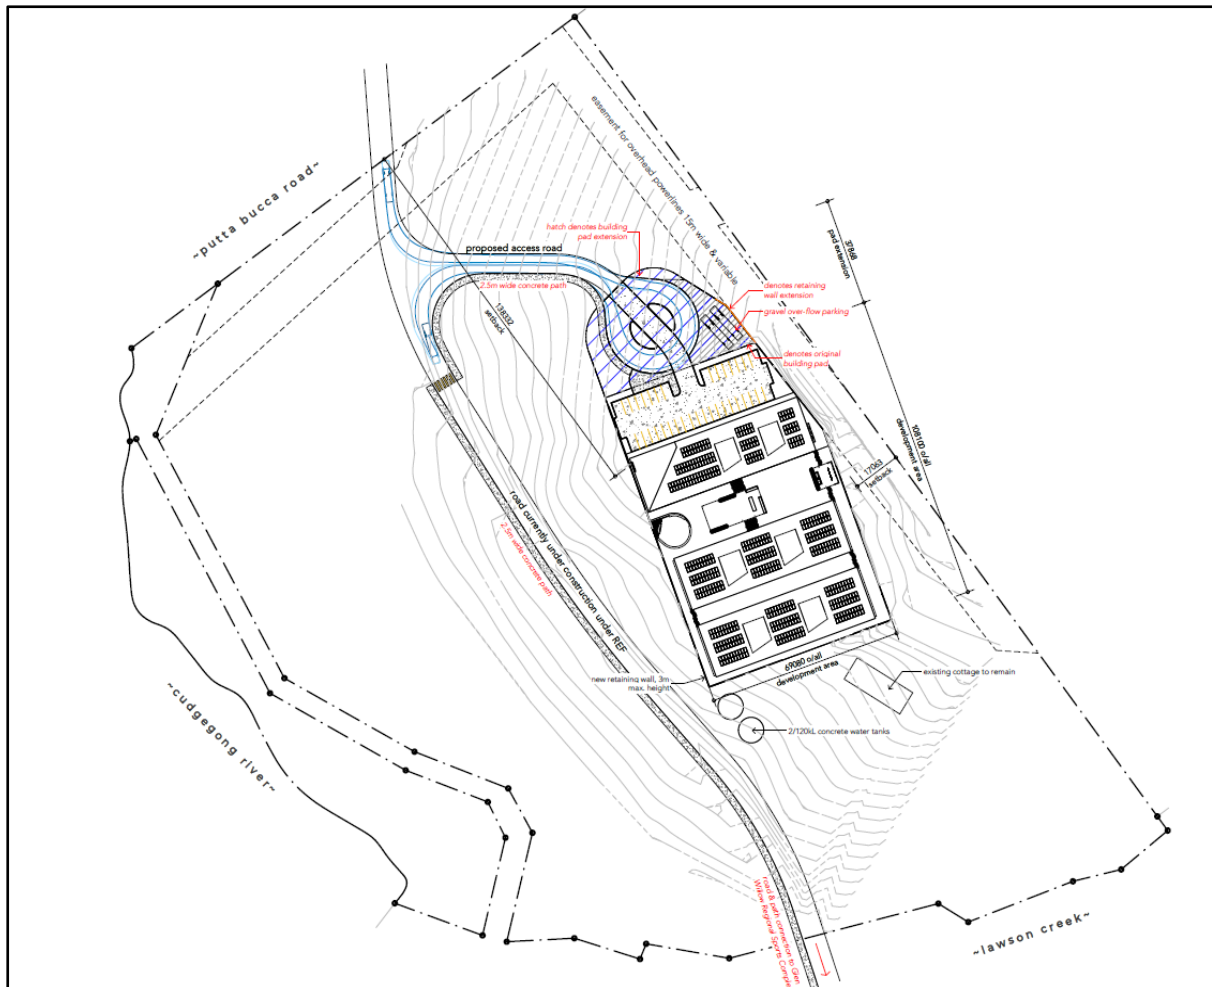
Extract from Architectural Plans, Proposed Site Plan
